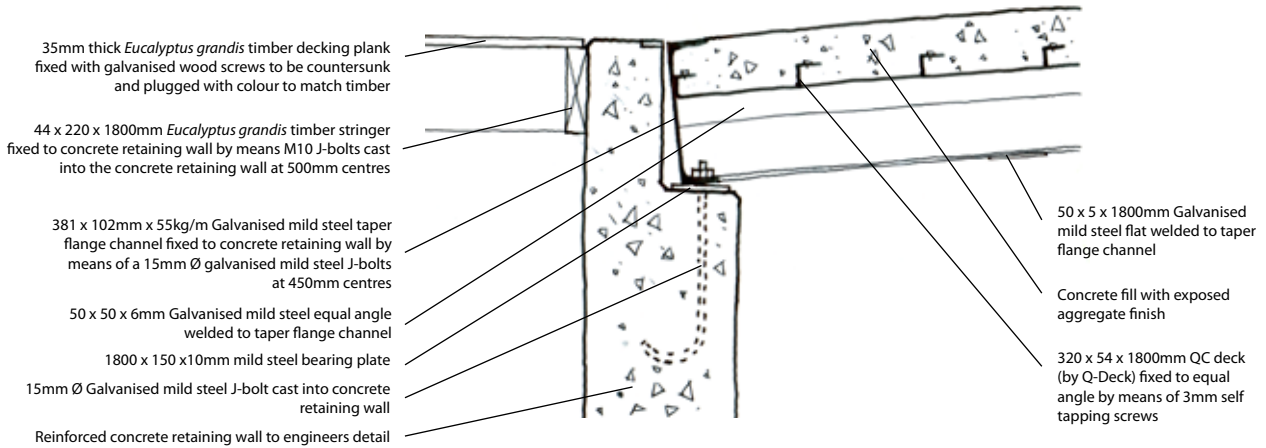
Detail F1 - Timber deck and bridge connection
